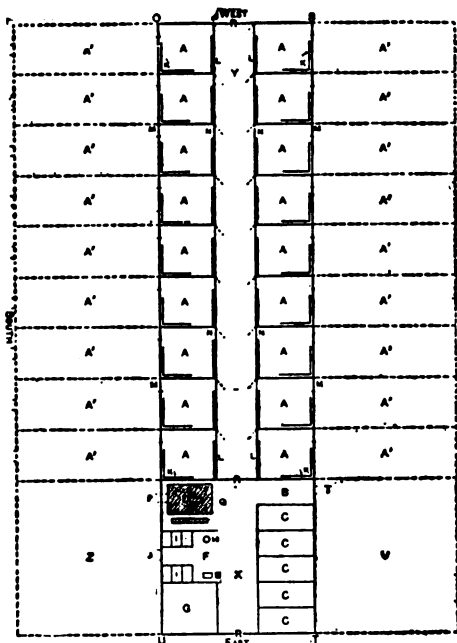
Plan of central hog house (120 x 30 feet) and yards. A, pen 10 x 10 feet with door M into yard A, and door N into alley Y, 8 feet wide; B, alley leading through door T into yard V; C and I feed bins; D, platform scales with runway and door P into yard Z; E stove for heating slop; F, feed mixing room with door J; G, office; H, water hydrant; K, fender as shown in Fig. 137; L, feeding trough with swinging partition as in Fig. 142. (Ill. Bulletin 109.)
